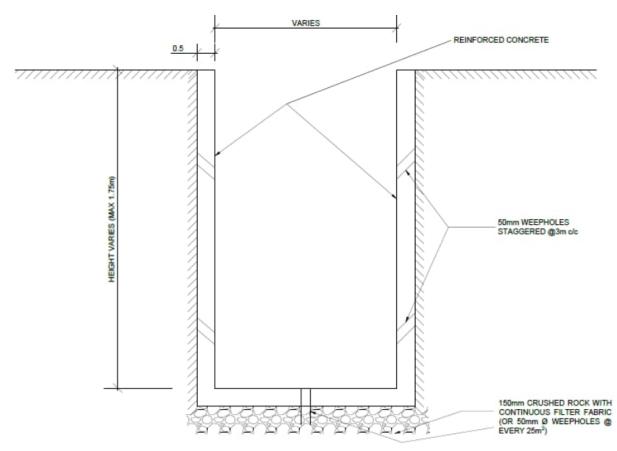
Rectangular Channel Section Source: Kampala Drainage Masterplan 2016
